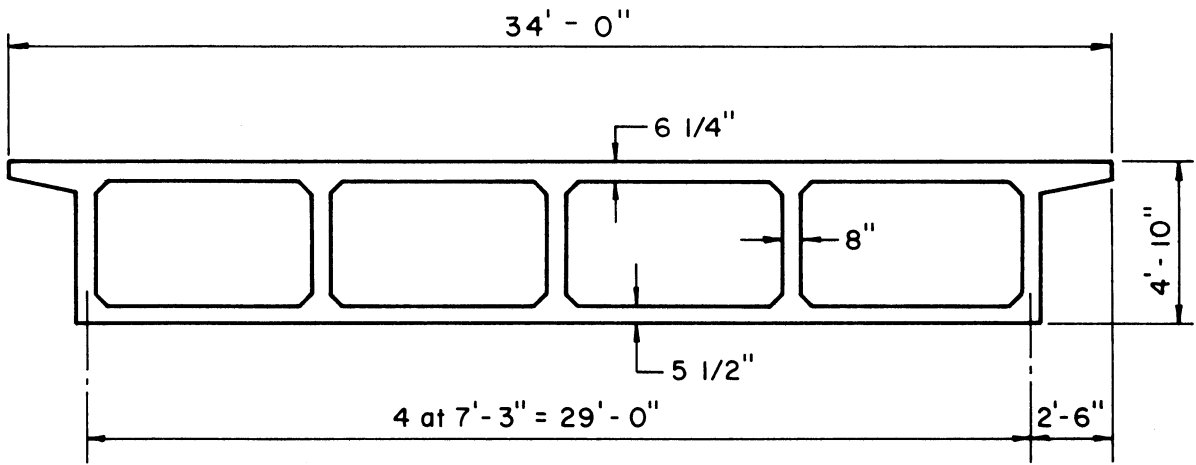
DIMENSIONS OF TYPICAL PROTOTYPE CROSS-SECTION
